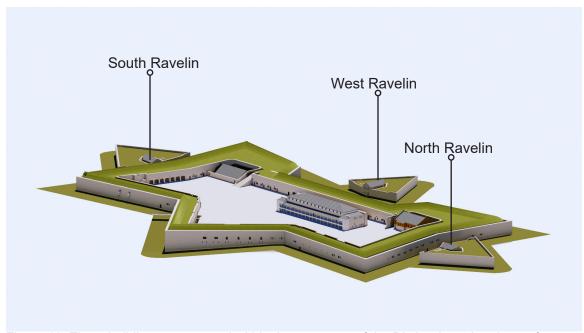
Three buildings are erected within three corners of the Ditch - these bomb proof buildings are called Ravelin. The West and North Ravelin are currently considered to be mothballed however the South Ravelin has been restored and is open for exploration to the public.
